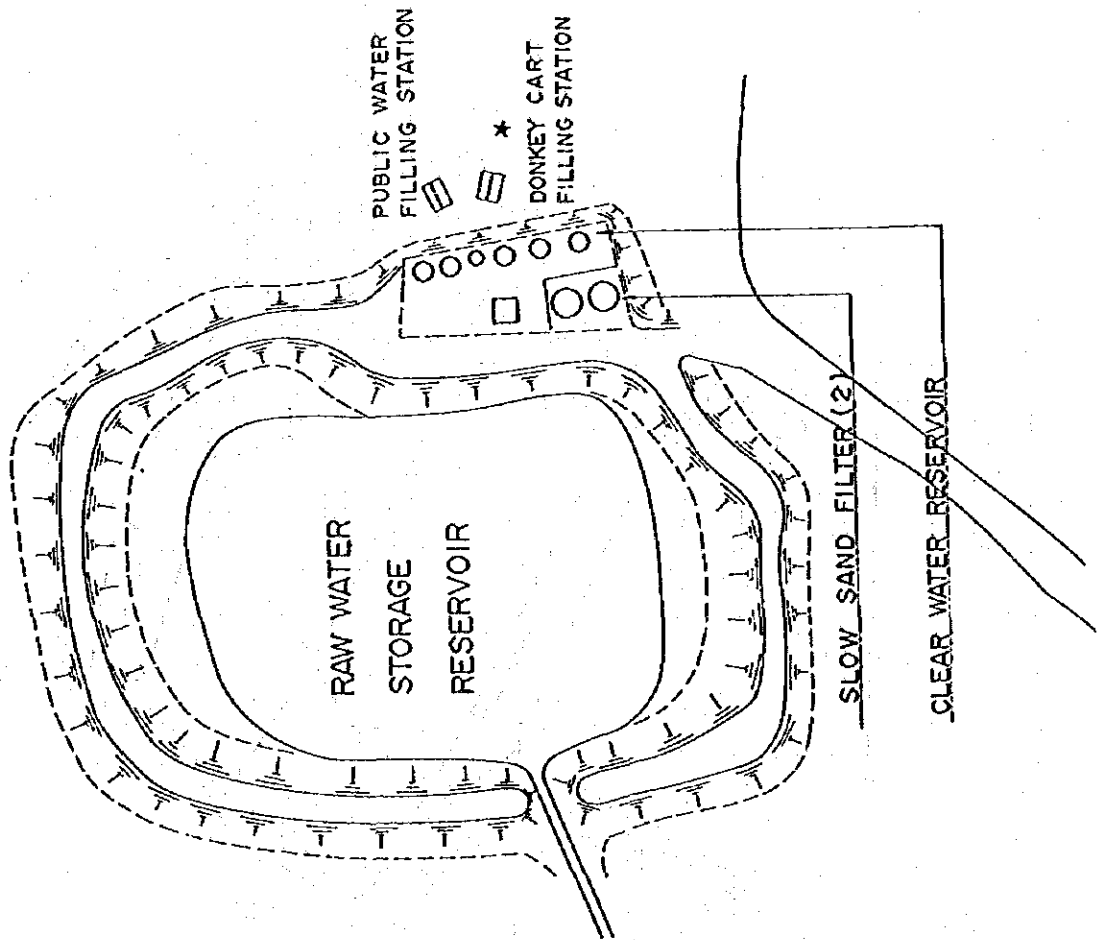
Existing Water Supply Facilities of Camp 3
